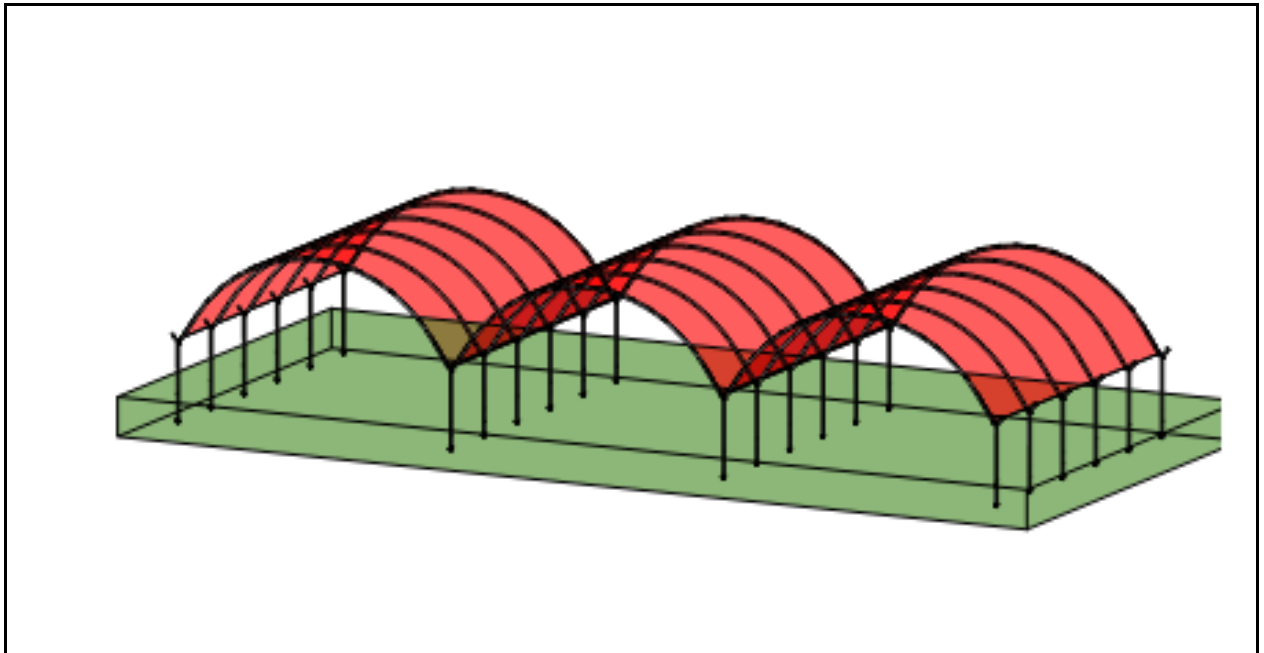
Proposed tunnel elevations (Haygrove Limited, 2021).
